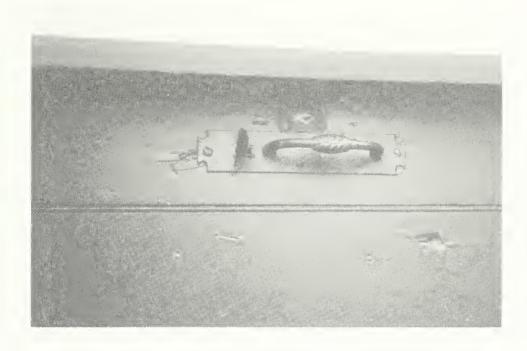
Kitchen wing, south elevation, hardware detail of doorway D104.
